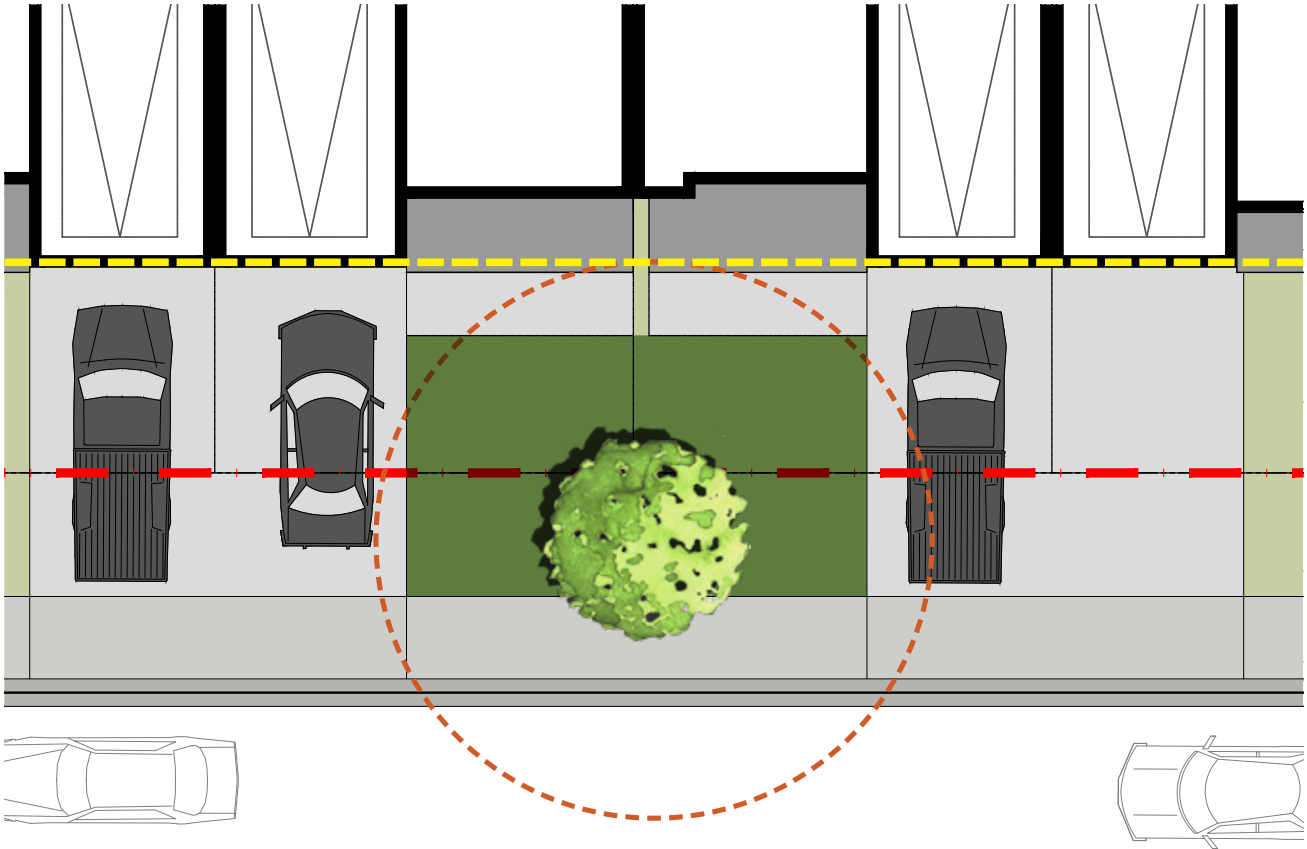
Tree Planting Setback - 42' Front Drive Singles
